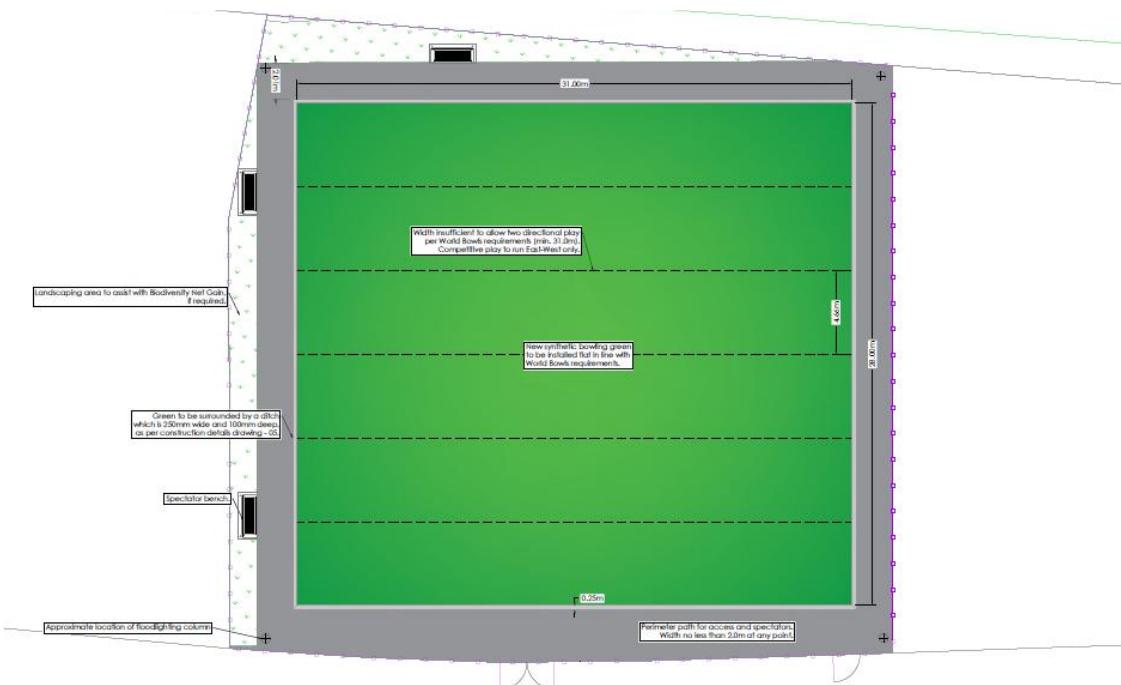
Site layout for proposed development (Sports Lab Ltd.).
